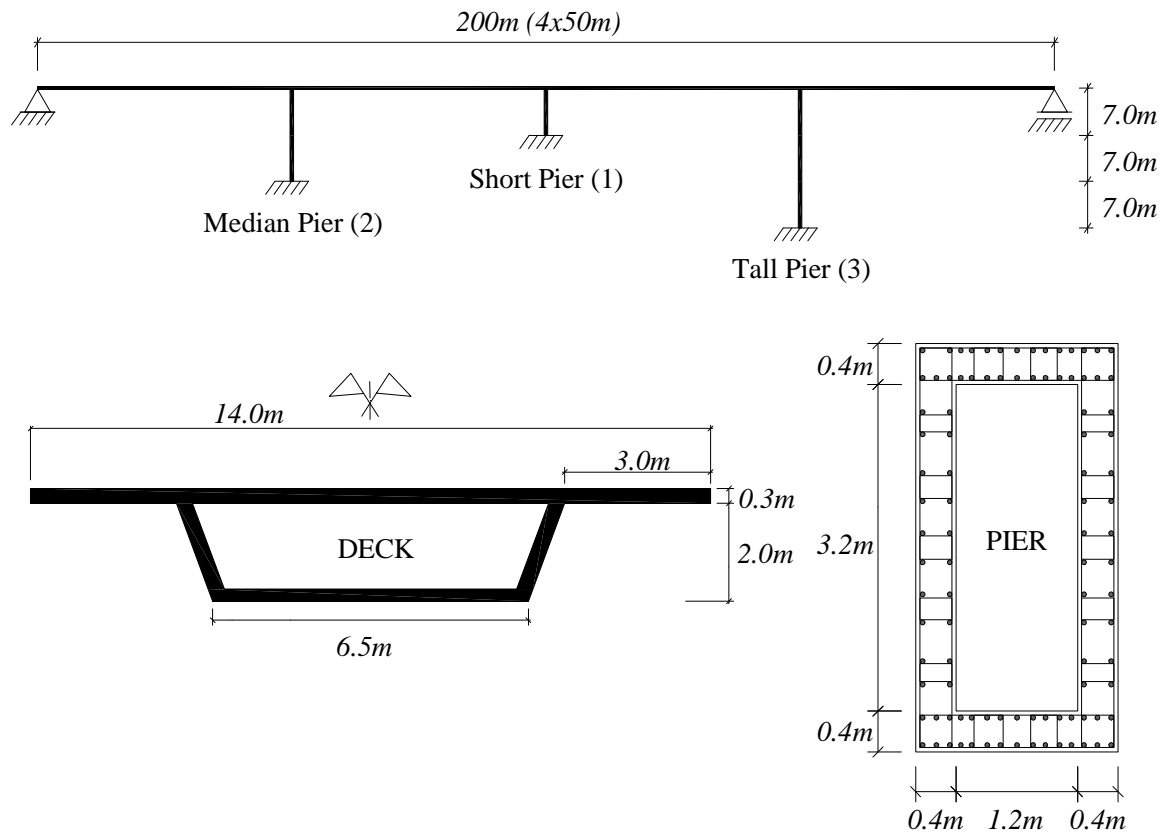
Geometrical configuration of Bridge 213 and of the different structural elements, constituting the studied bridges.
